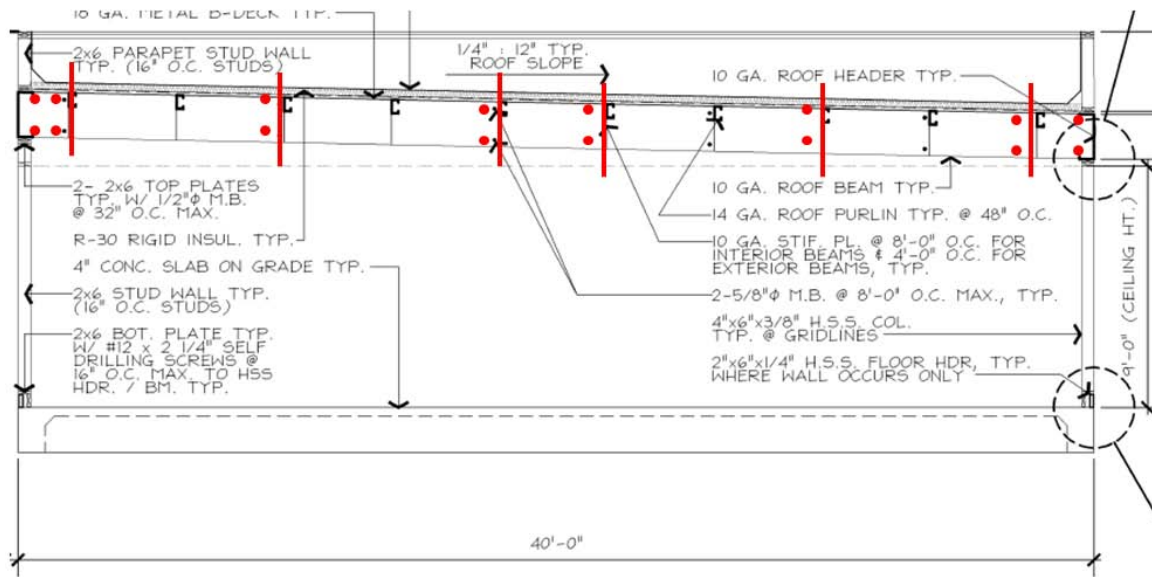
Bolt and Stiffener Plate Locations for 12x40 Modules
